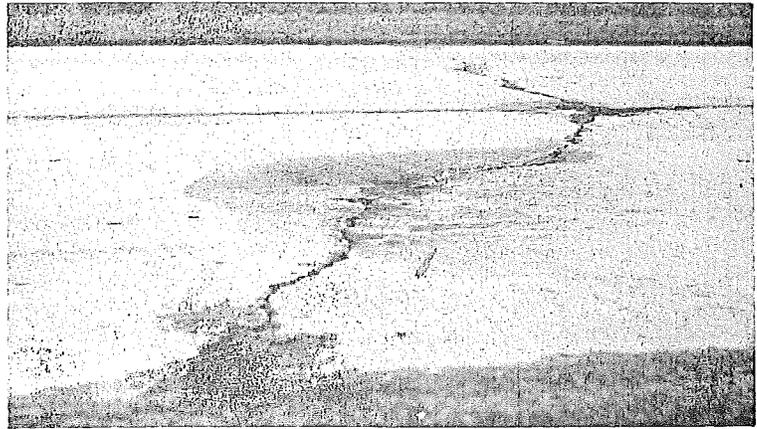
Joint blowup. The localized buckling or shattering of a rigid pavement at a joint caused by excessive longitudinal pressure.
